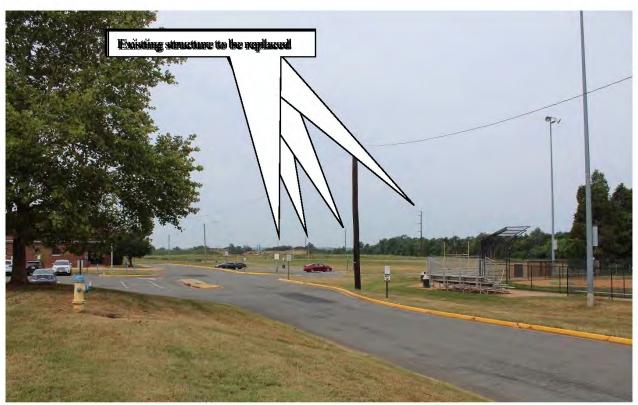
Photo location 3- View from Jennie Dean Memorial Site (Multiple project structures visible), facing northwest.
